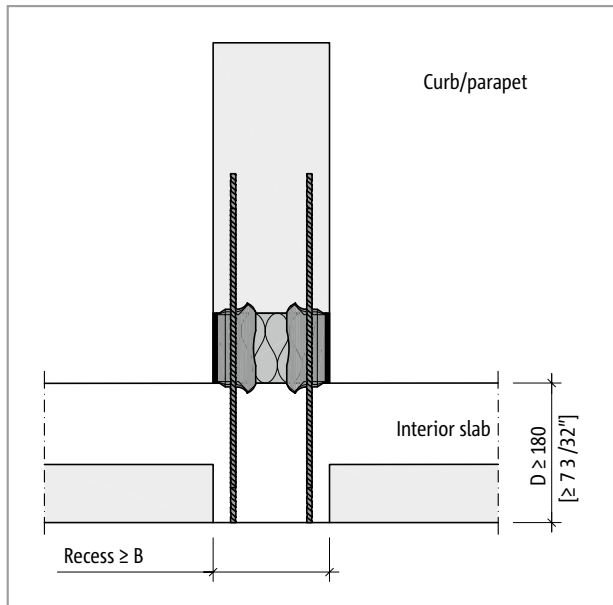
Schöck Isokorb® CXT Type CA: Section; Minimum measurement Recess Component panel
